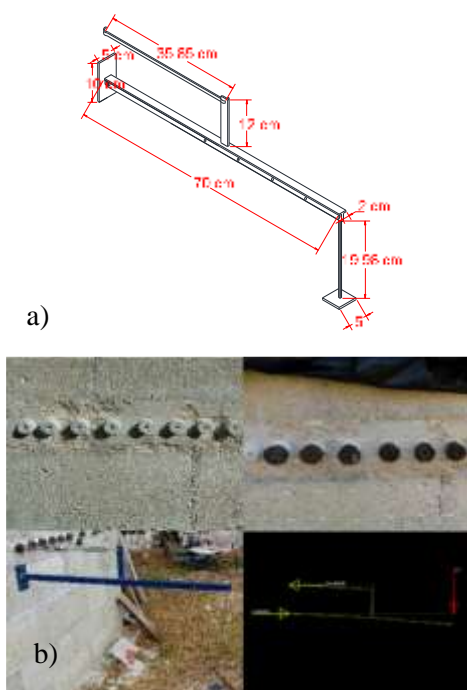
a) (b) Adhesion testing device, (b) Process of testing adhesion of mortar samples on block wall
